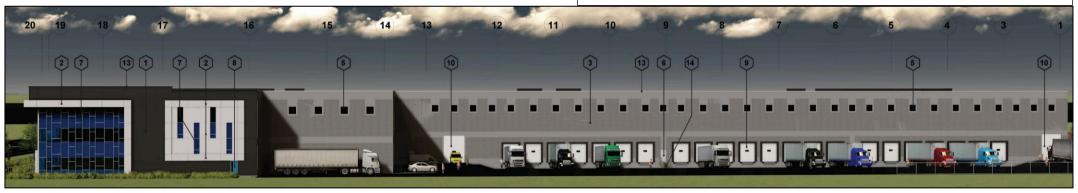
Proposed North 1 Elevation (Battaglia Architect Inc., March 2021)
